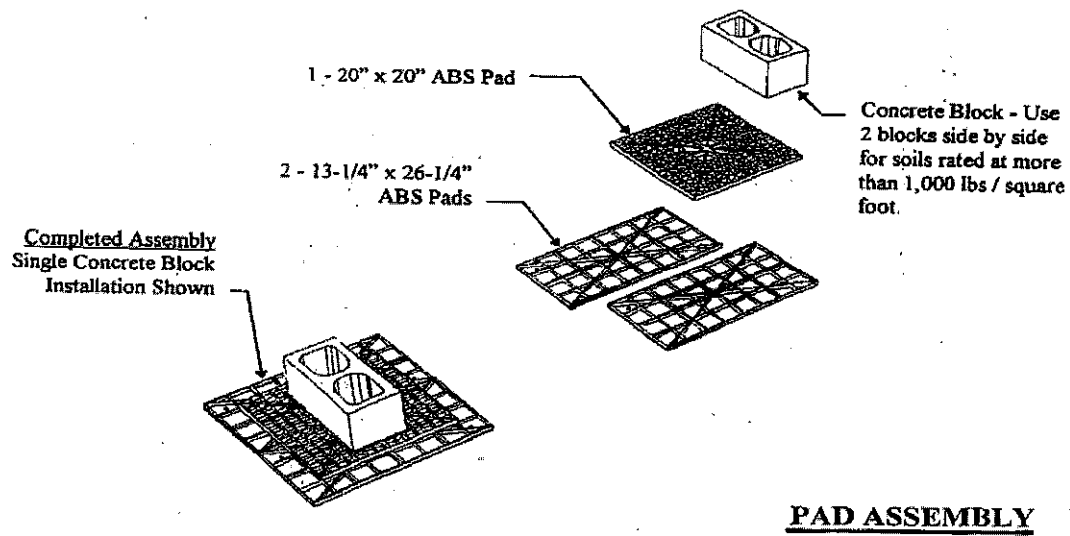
ABS pad assembly installation instructions for a 26"x 26" configuration
